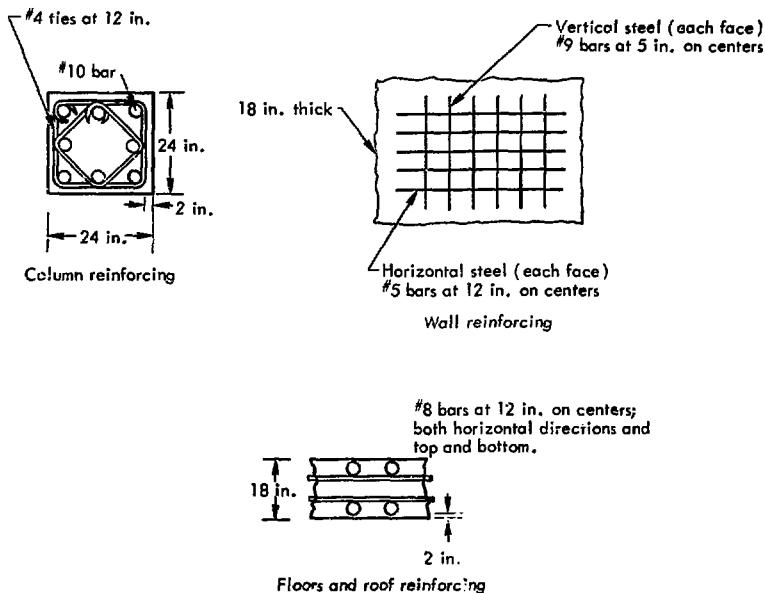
Reinforcing details of walls, roofs, floor, and columns.
